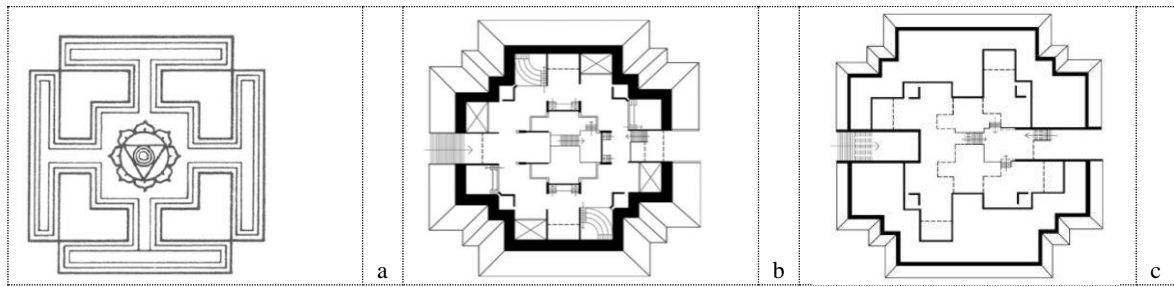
a. Mandala diagram used as inspiration for the plan of the pavilion (Jahanbegloo, 2019) b. Basement floor plan (URL-79) c. Site plan (URL-79)
